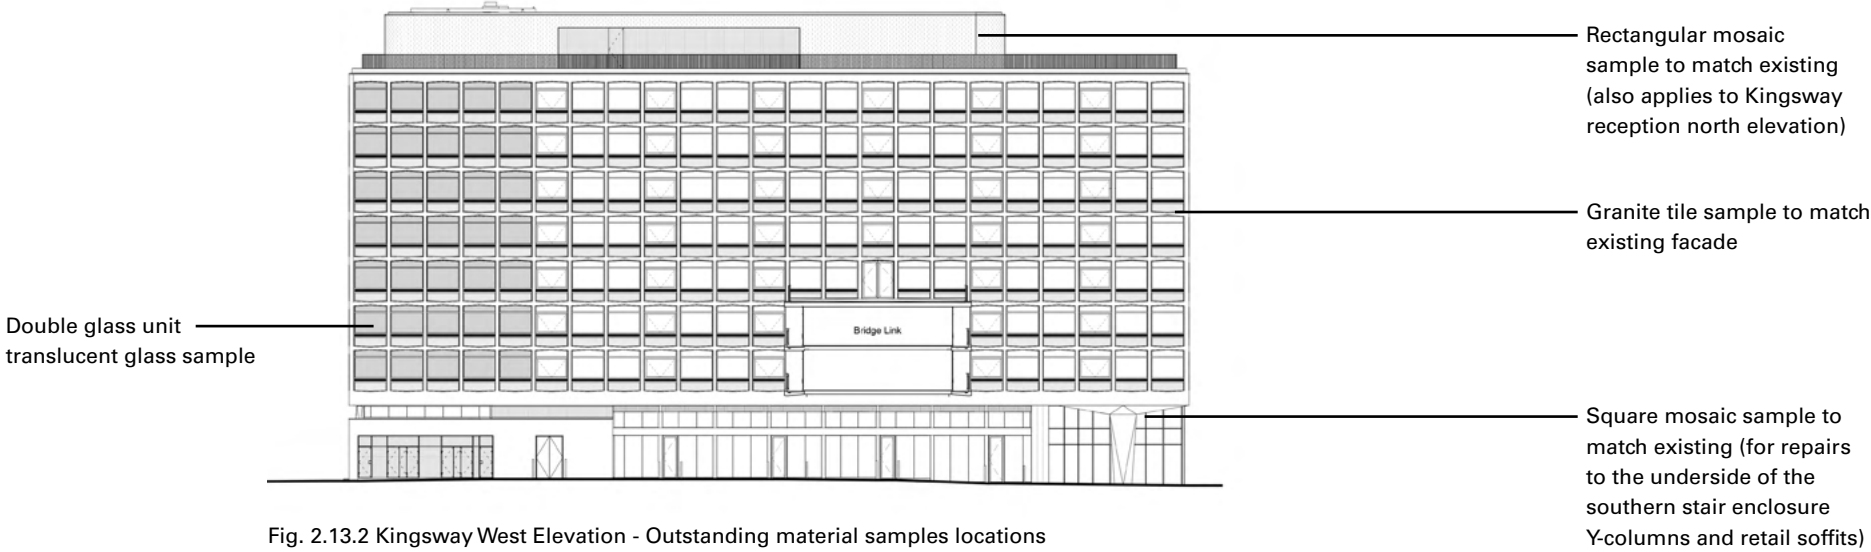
Kingsway West Elevation - Outstanding material samples locations
